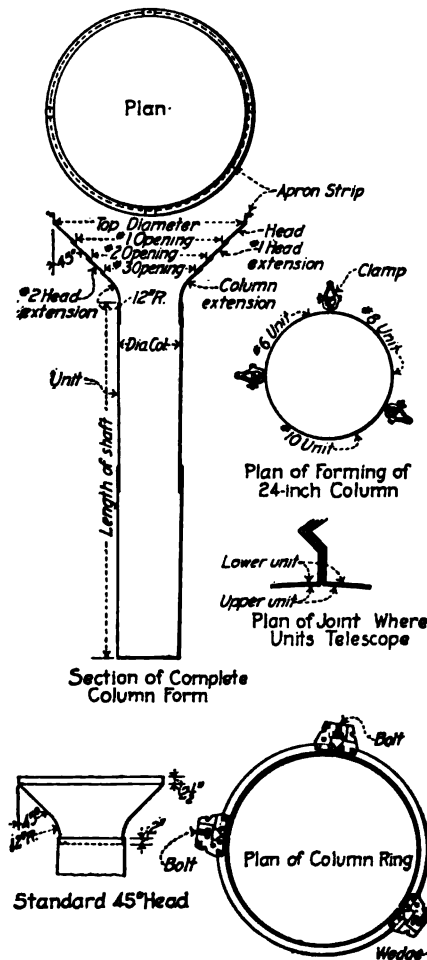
Adjustable steel column heads, Hydraulic Pressed Steel Co.
